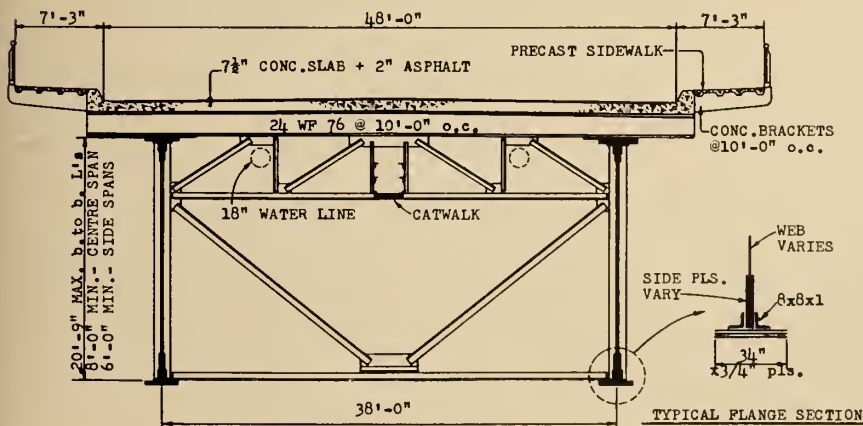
Oak Street bridge plate girder details. Trussed floor beams contributed to a considerable saving of material in the deck system. Side plates were added to the plate girder flanges because they added to bending resistance and decreased the unsupported depth of the web plate
